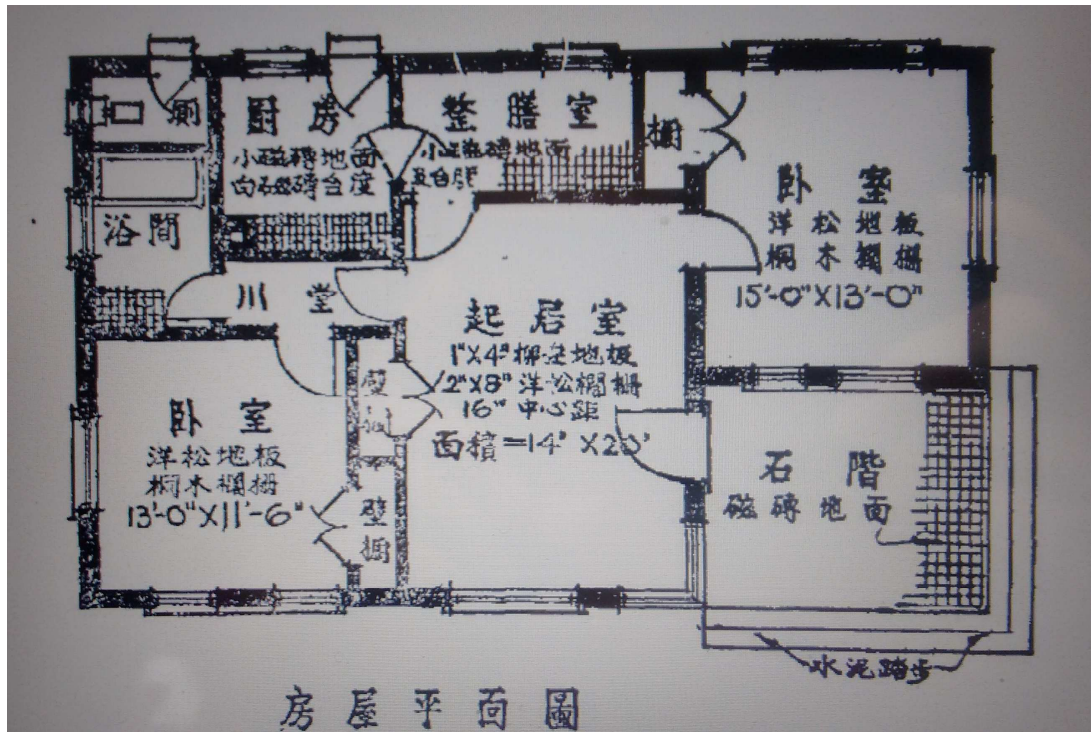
K's design of a country house in plan. The author also indicated the materials on the plan here (Source: Jin 1940, *Zixiu* 120)
